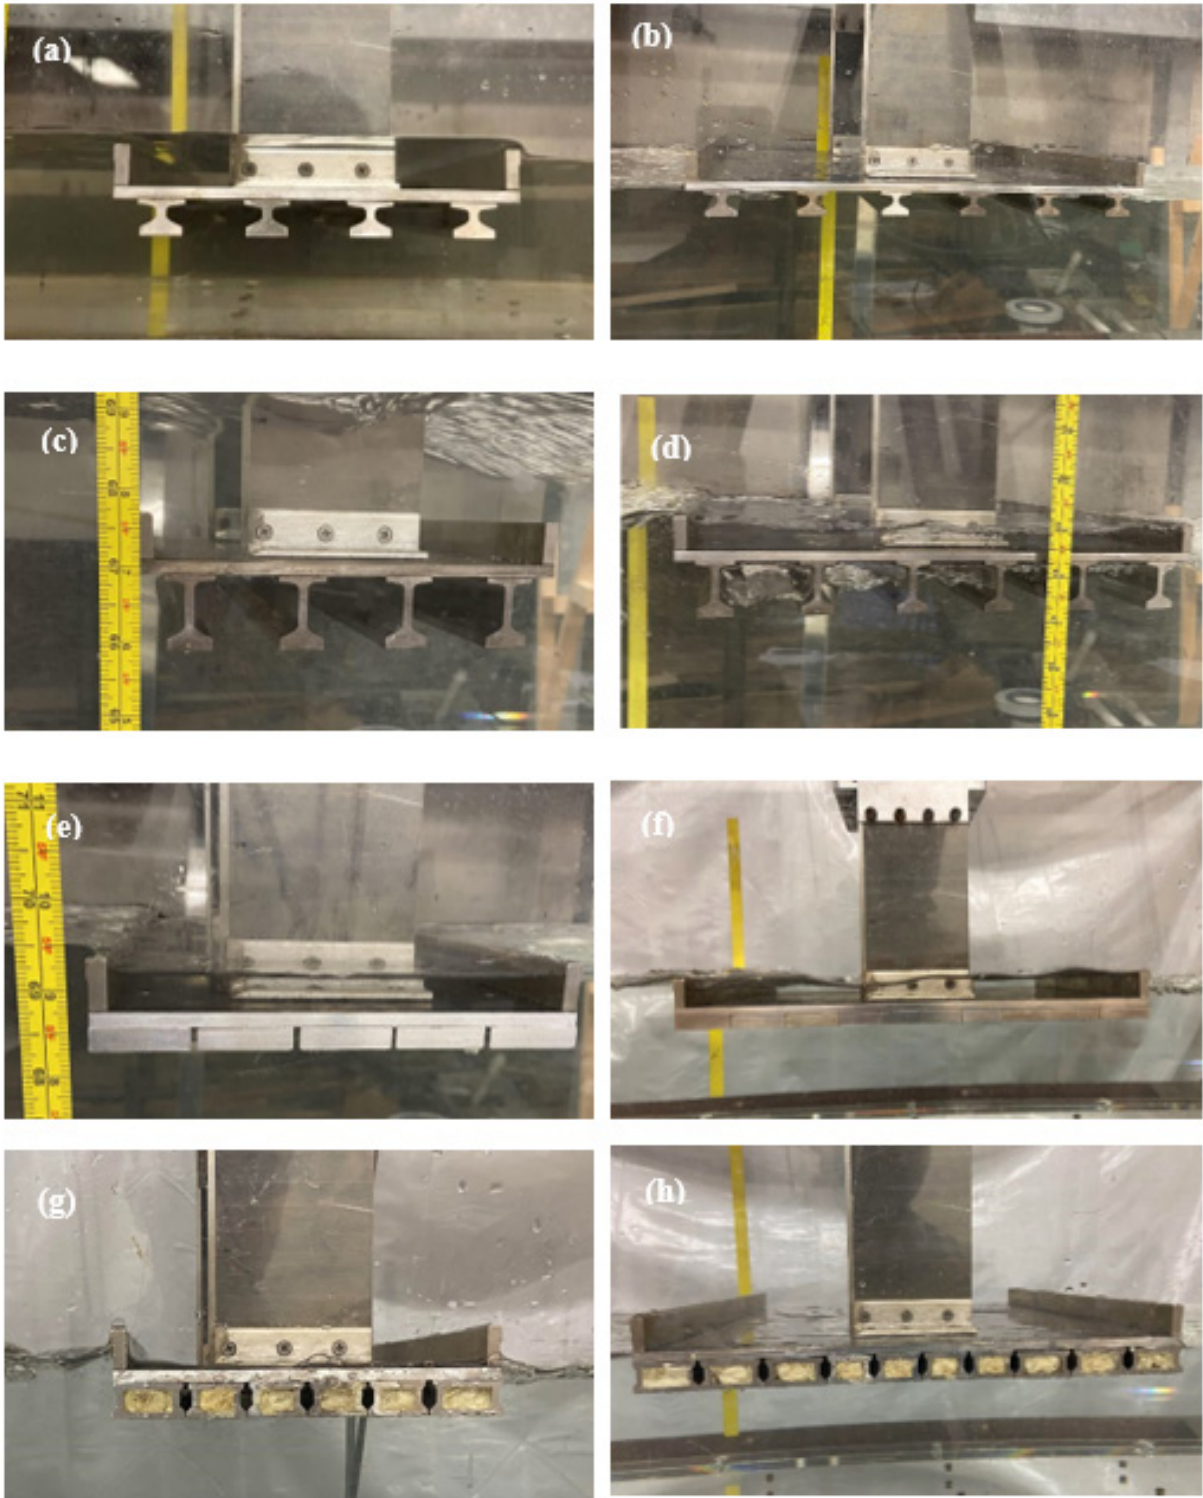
Test Series A: Bridge Models: (a) 26-ft deck TX-28, (b) 46-ft deck TX-28, (c) 26-ft deck TX-54, (d) 46-ft deck TX-54, (e) 26-ft deck SB-15, (f) 46-ft deck SB-15, (g) 26-ft deck BB-28, (h) 46-ft deck BB-28
